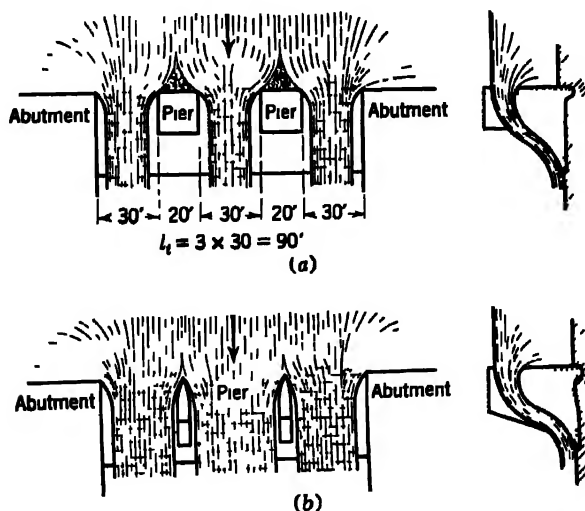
(a) Complete contractions due to abutments and large piers (b) Partial contractions due to sharp piers.
